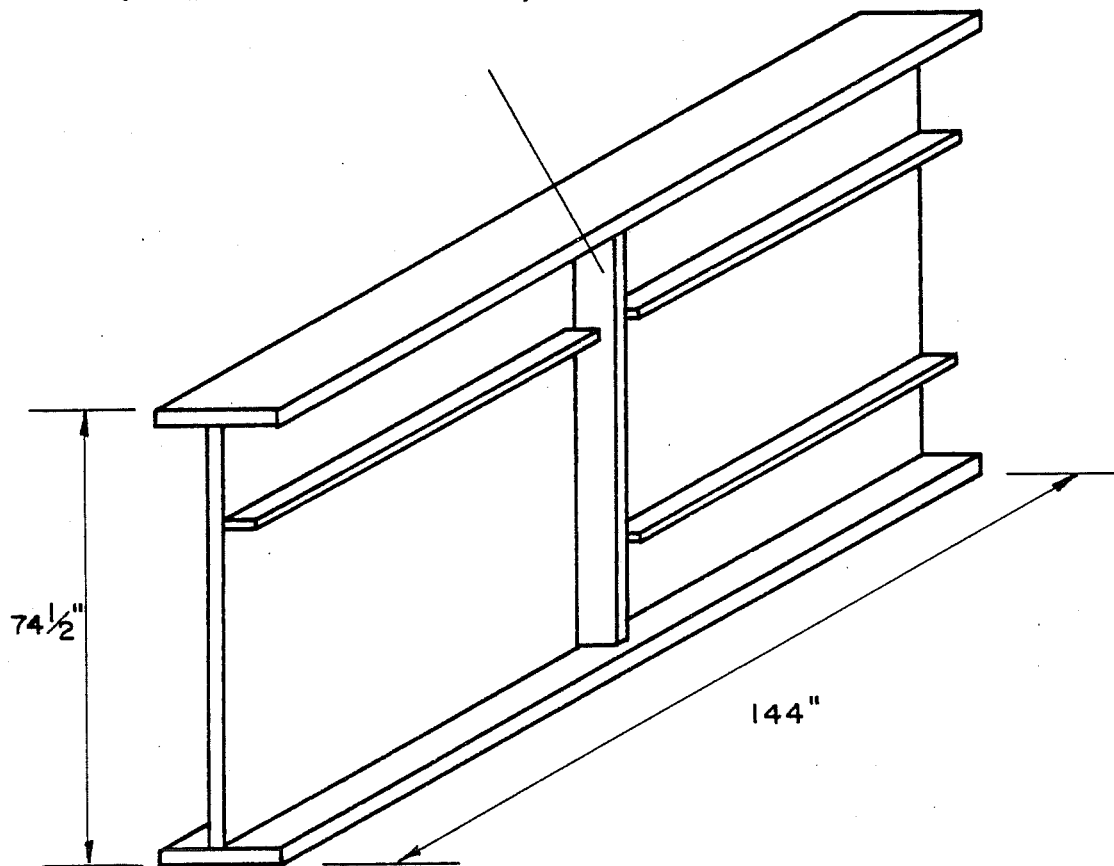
Full-scale finite element model of longitudinal-transverse stiffener intersection detail
